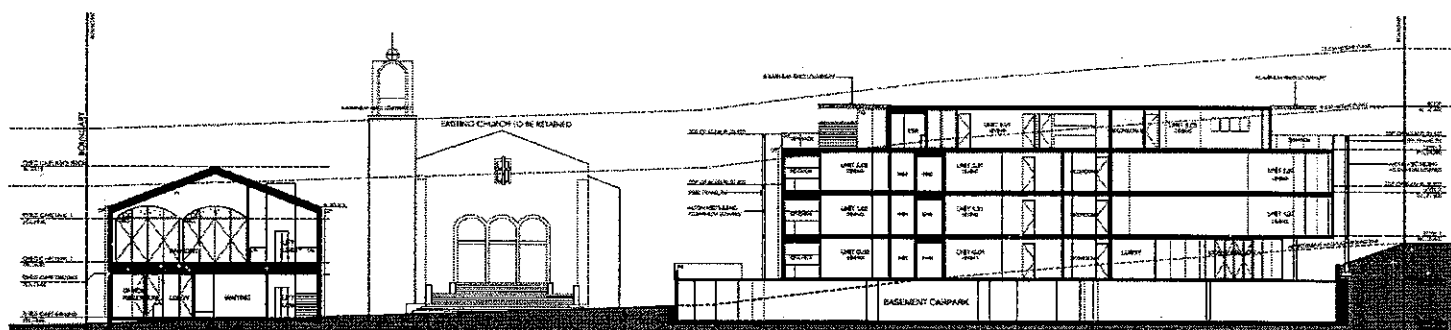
Section 1 of the proposal demonstrating its varying building heights
